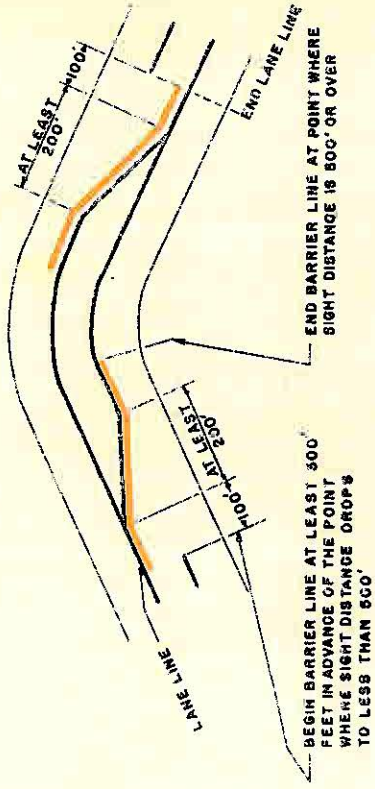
PAVEMENT MARKINGS - EMERGENCY STANDARDS (THREE LANE PAVEMENTS)
